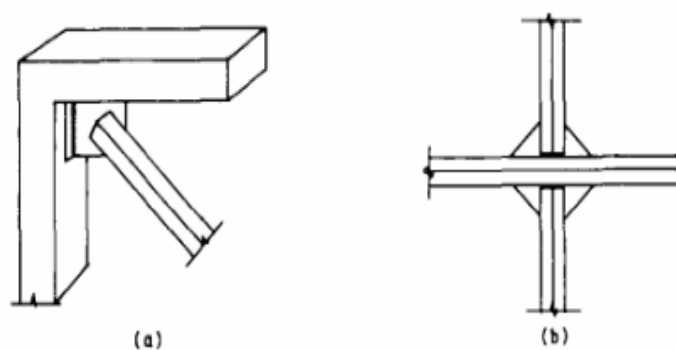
Connection detail of; (a) the steel brace to concrete frame, (b) the steel cross braces to each other.[3]
